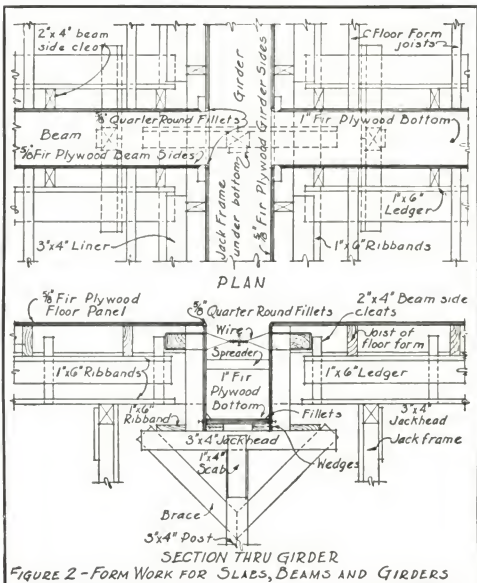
FORM WORK FOR SLABS, BEAMS AND GIRDERS
